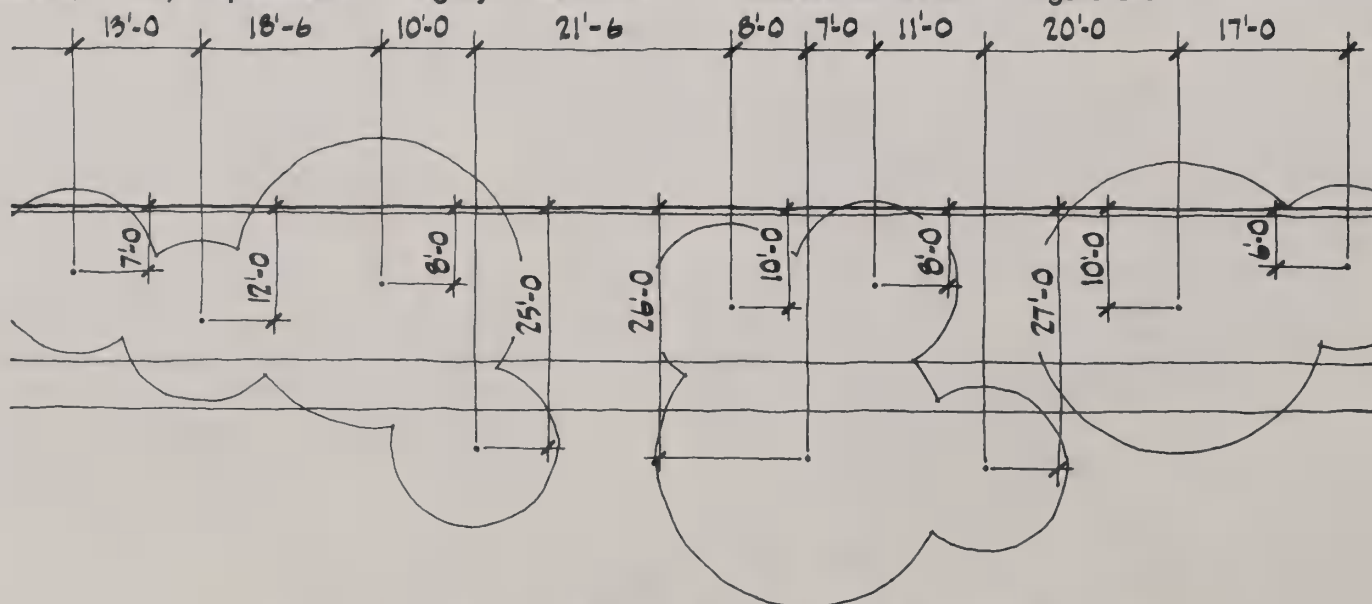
A Staking Plan As it Would Be Laid Out in the Field
